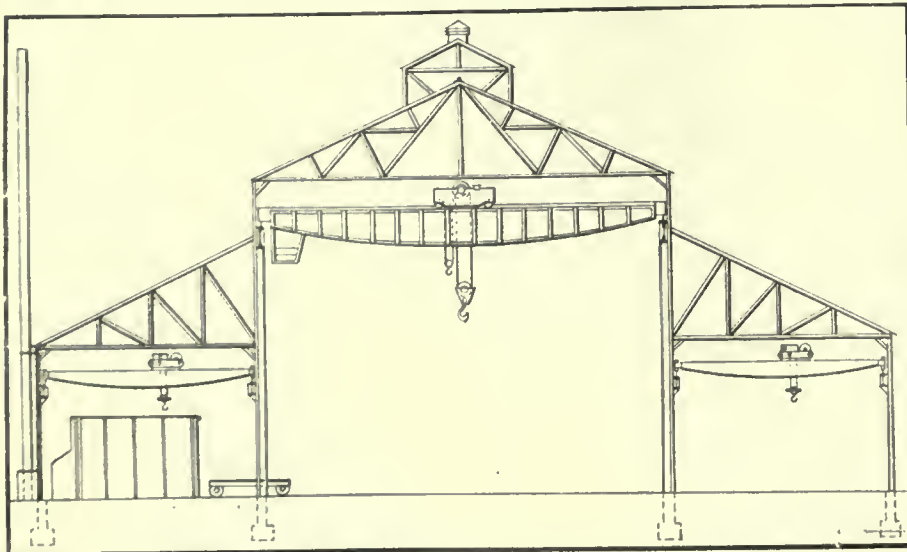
RIDGE ROOF FLANKED BY LEAN-TO ROOFS.
